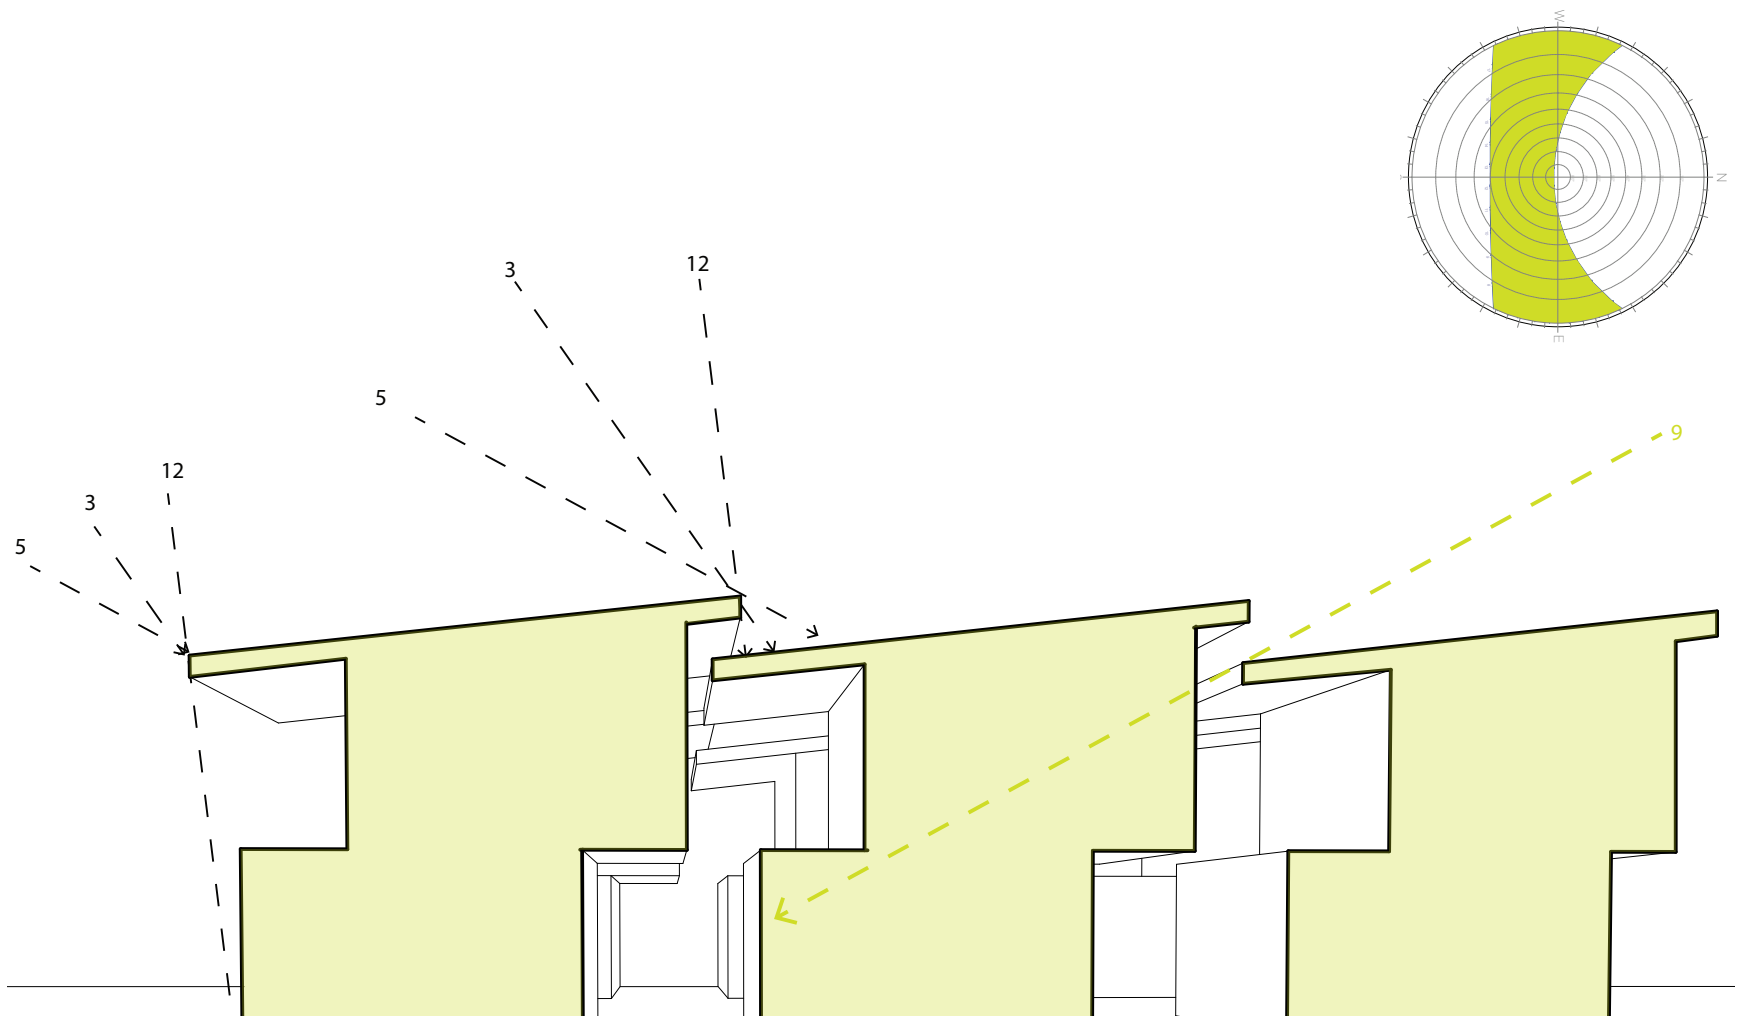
SECTIONAL DIAGRAM SHOWING ROOF OVERHANGS SHADING OUTDOOR PORCHES
